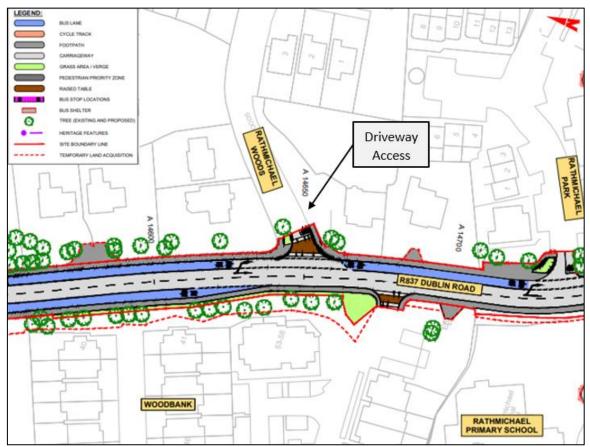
Extract from General Arrangement Drawings at Rathmichael Woods (Sheet 42)
